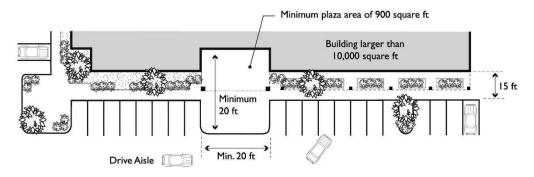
A.1.A: FOUNDATION BASE AT BUILDING ENTRANCE
